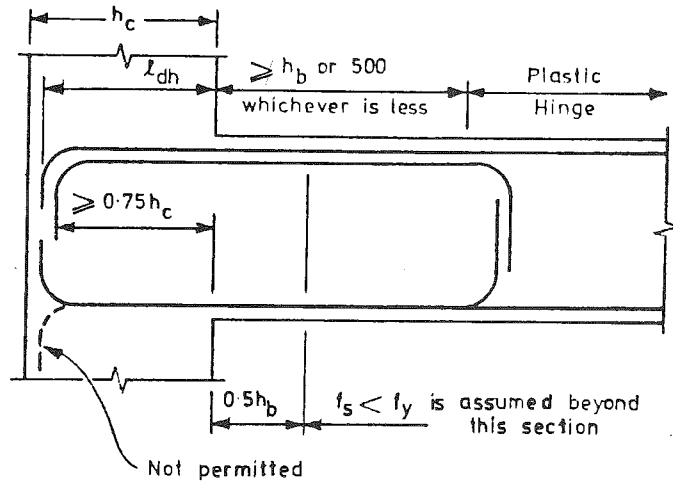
Anchorage of Beam Bars When Critical Section of Plastic Hinge is Located at Sufficient Distance From Column Face [5].
